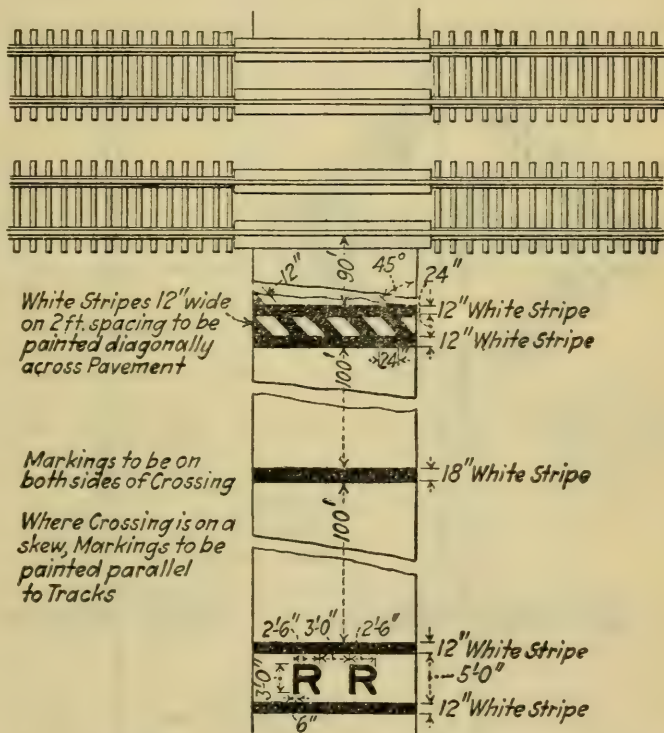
Pavement markings at railroad crossings. (N. Y. State, 1926.)
